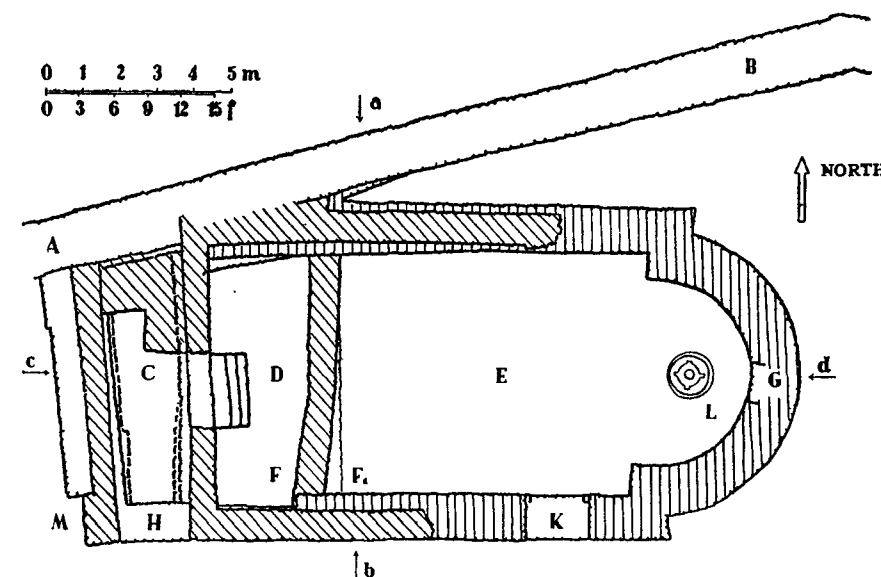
GROUND-PLAN OF CHURCH, 1:200
